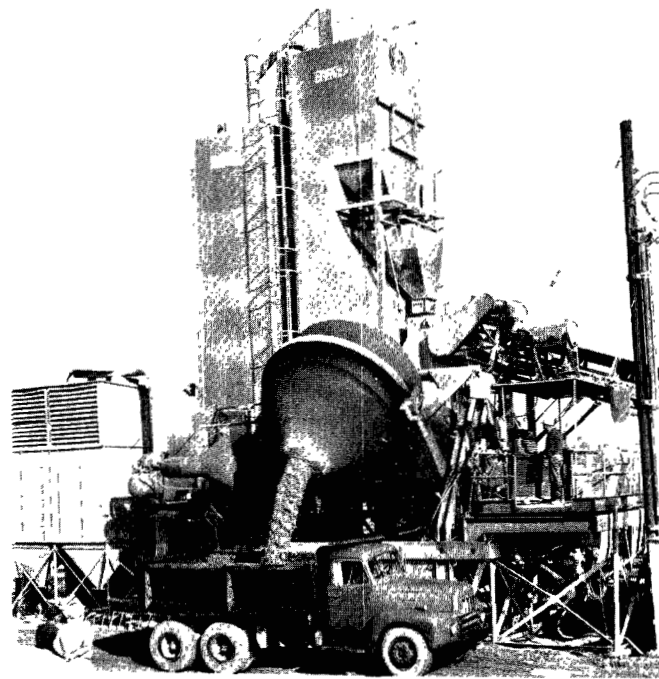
Overall view of a central mix concrete-batching plant controlled by a baghouse (Griffith Co., Los Angeles, Calif.).
